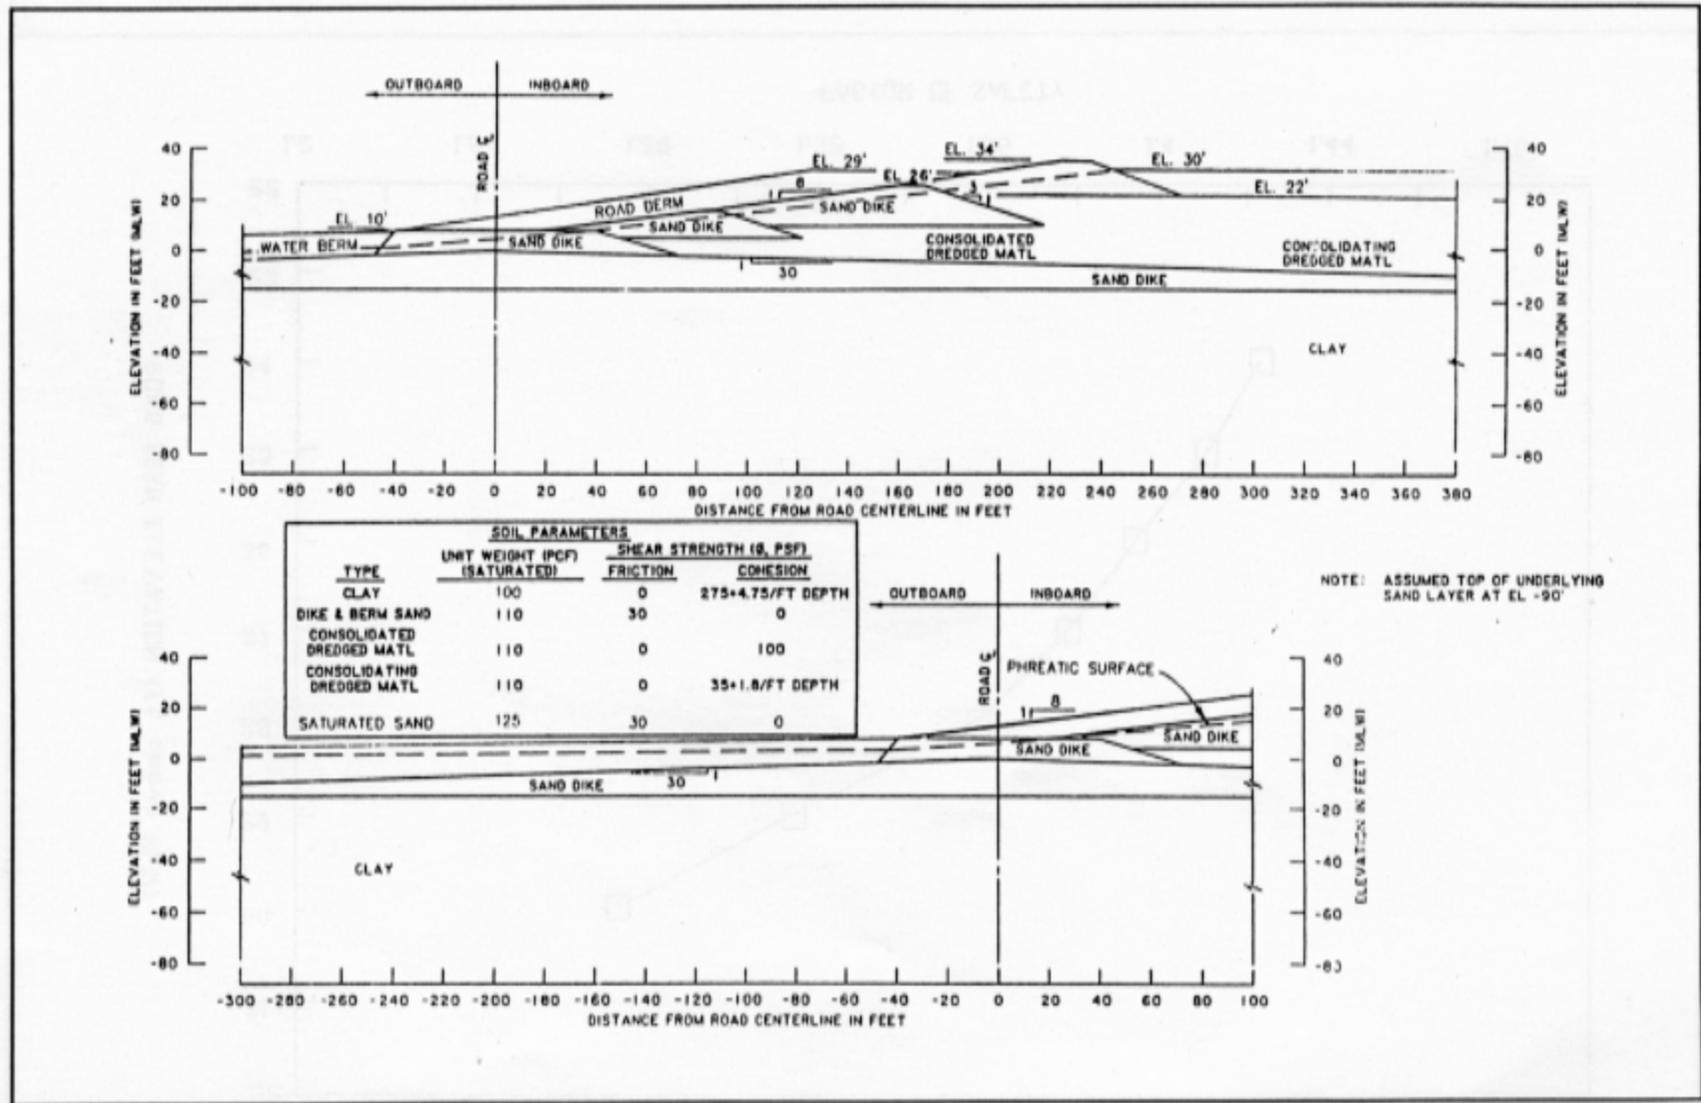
West perimeter dike cross-section with road berm addition (1V:8H slope)
